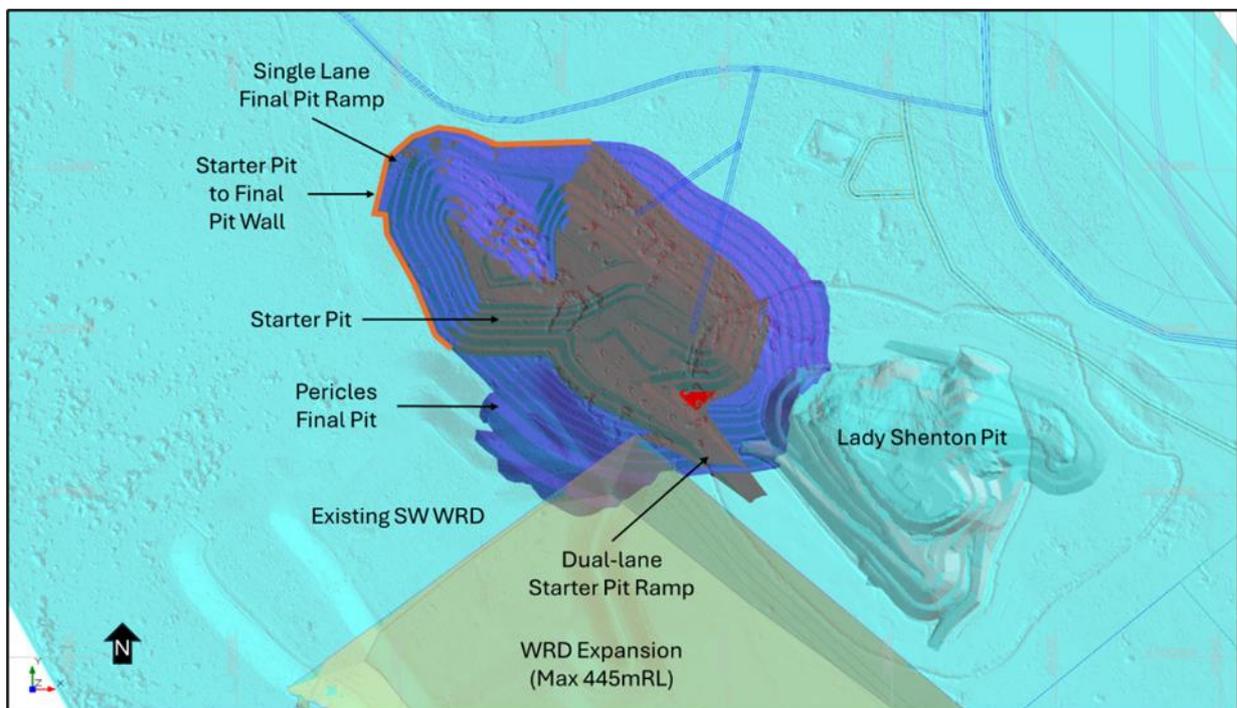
Plan view of Pericles starter pit overlain on final pit design
